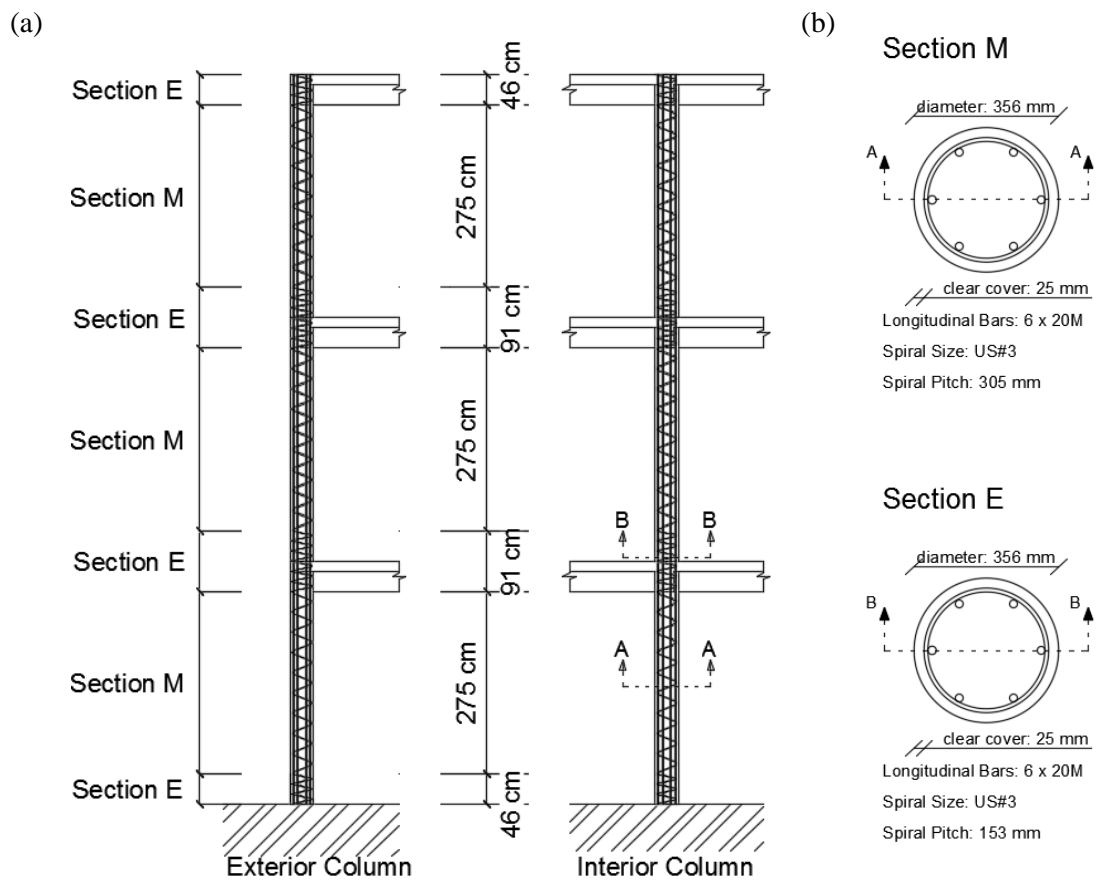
Column reinforcing details: (a) Interior and exterior columns, and (b) middle (Section M) and end (Section 3) column sections.
